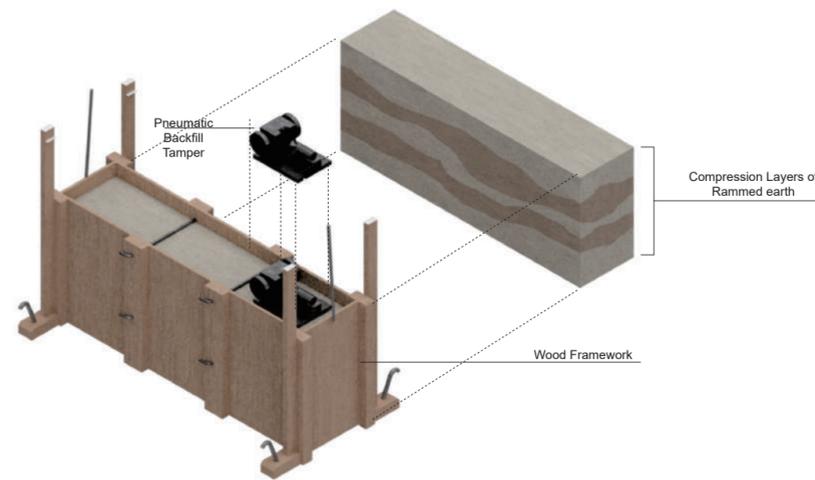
Construction Process of Rammed Earth Wall (Modelled By Ming Hung Davis Mak)
